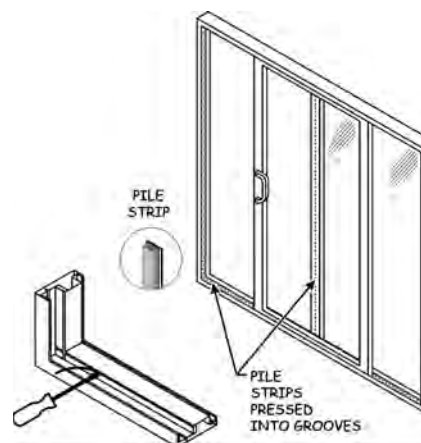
SLIDING GLASS DOOR PILE WEATHERSTRIPPING
